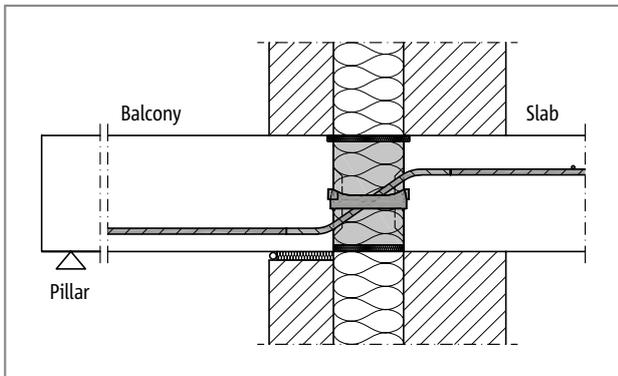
Schöck Isokorb® XT type Q: Connection with double wall masonry with core insulation (XT type Q-V5 to V8)
